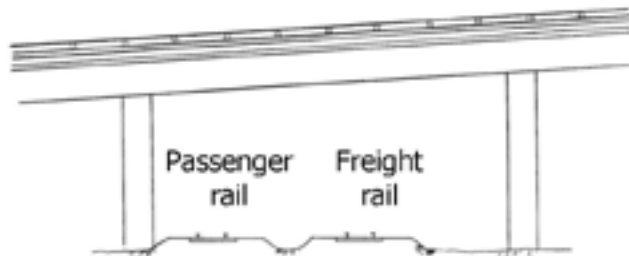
Bridge elevation view with one passenger rail and one freight rail track below the bridge.
